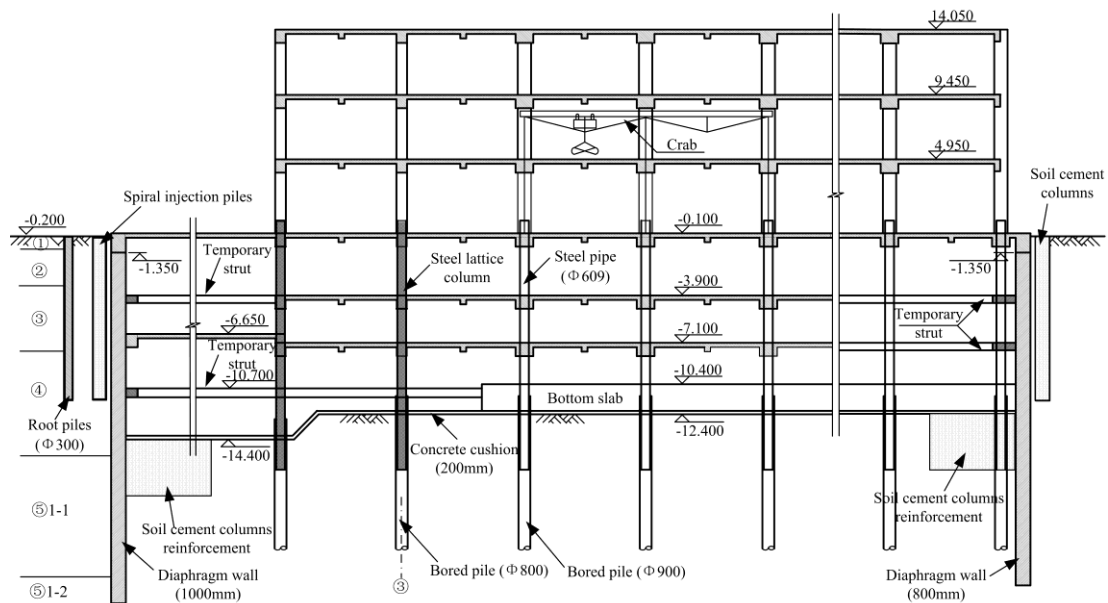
Sectional view of Section A-A (unit: m) (Xu 2007)
